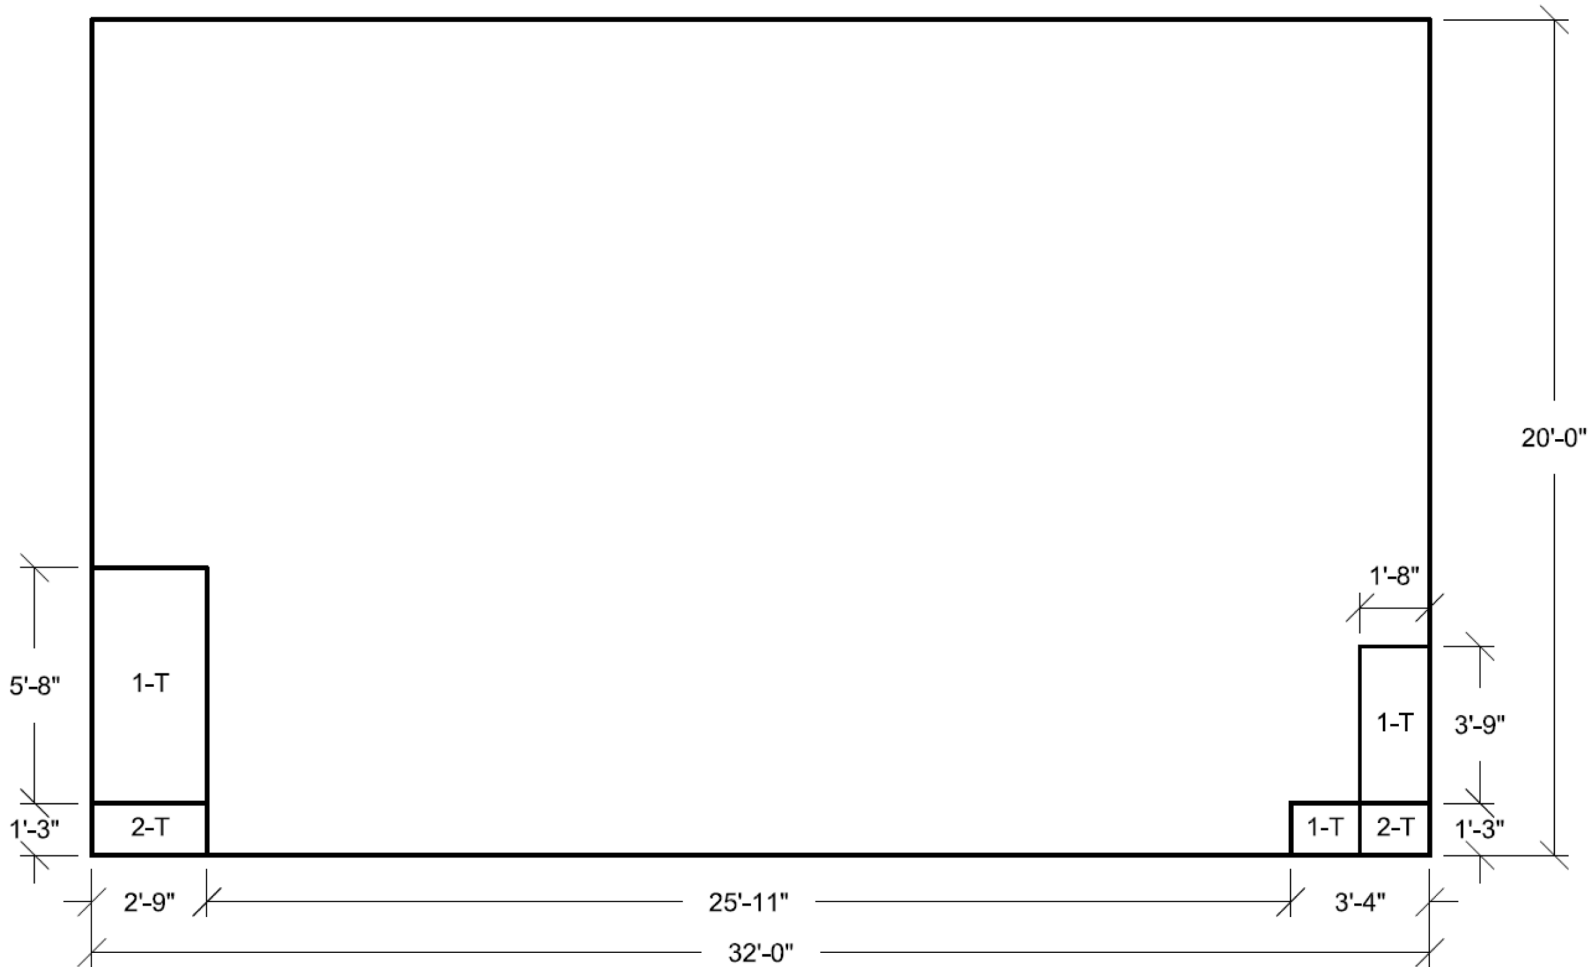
H.6-199 DGFOV Wall 14 Looking From Outside
